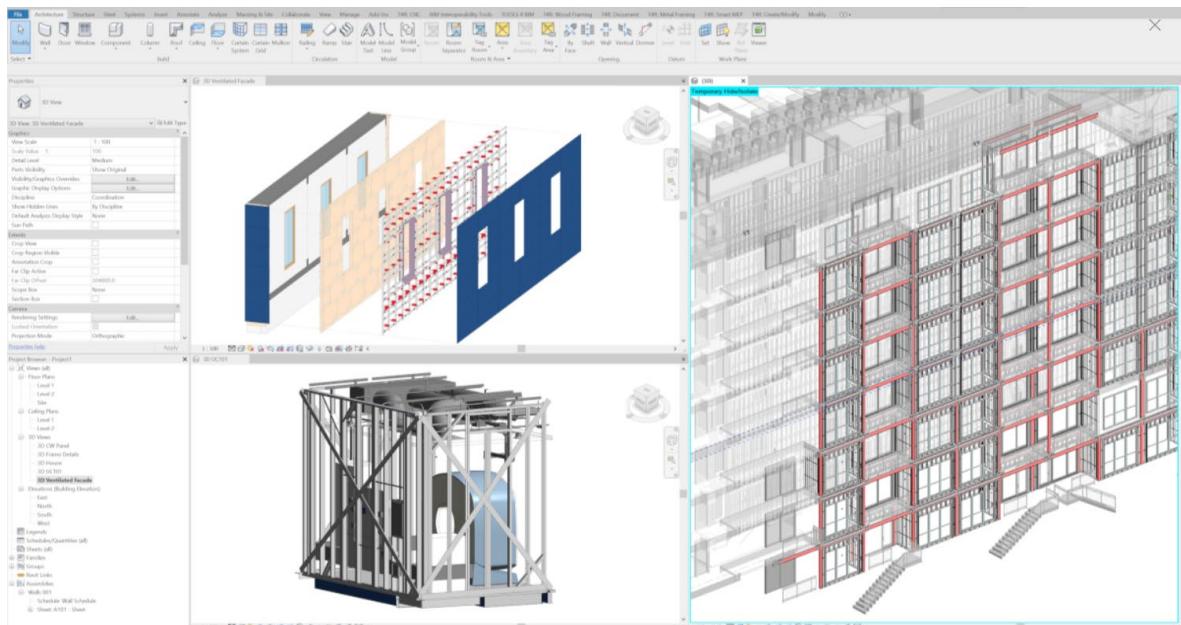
Metal Framing Wall+ tool capability in Revit for (a) house light gauge steel framing and (b) mid-rise building framing [58].
